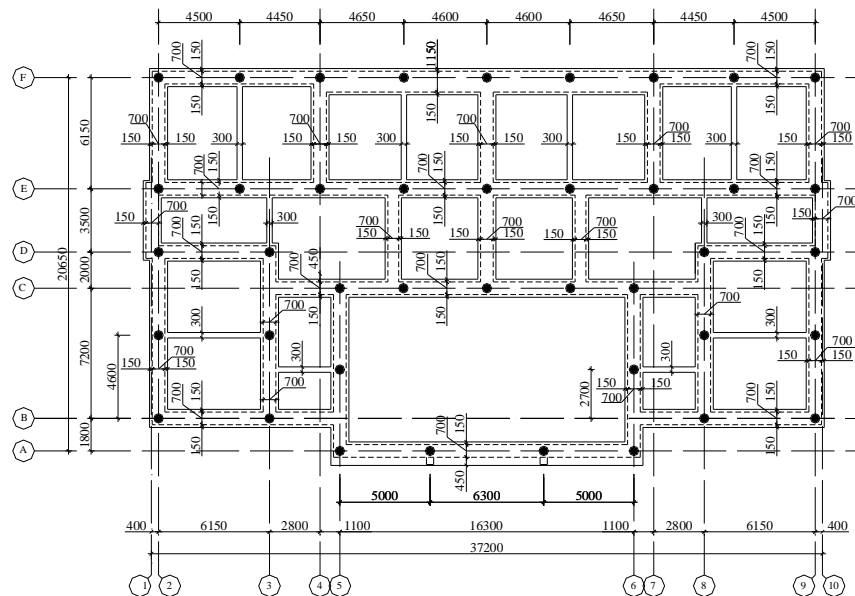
Plan of MDRBs' location on the lower continuous beams in the basement of the school building
